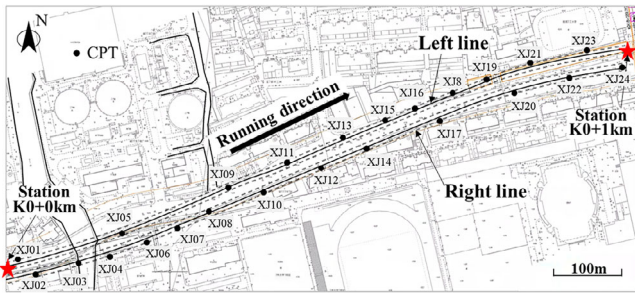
Typical CPT layout for the Suzhou No.6 metro line project; section from Station K0 + 0 km to Station K0 + 1km shown.
